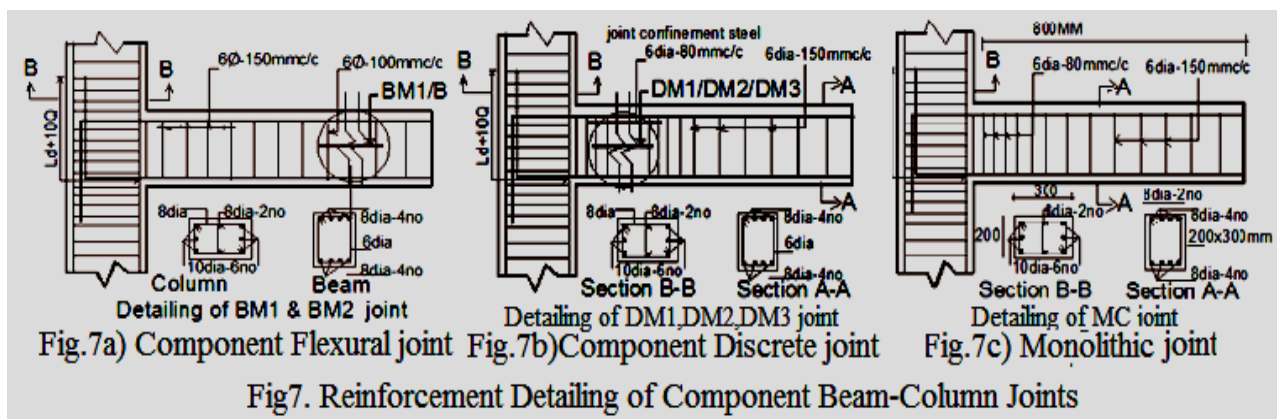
Reinforcement Detailing of Component Beam-Column Joints
